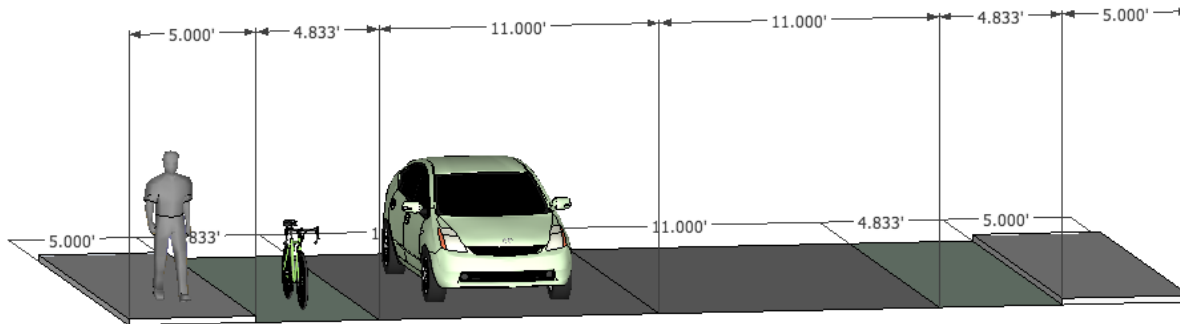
Cross Sectional View of the Street under the Commuter Rail Underpass
